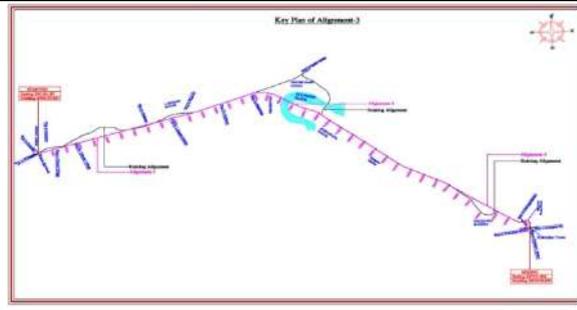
Proposed road alignment from Kokrajhar to Bilashipara
